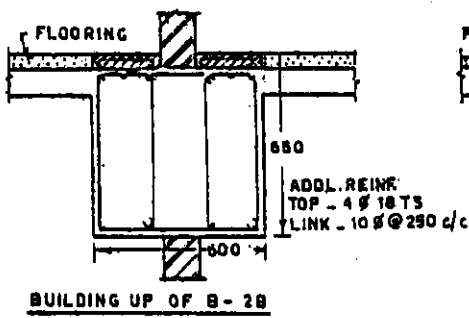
BUILDING UP OF BEAM/COLUMN FROM ONE SIDE-CASE IV
